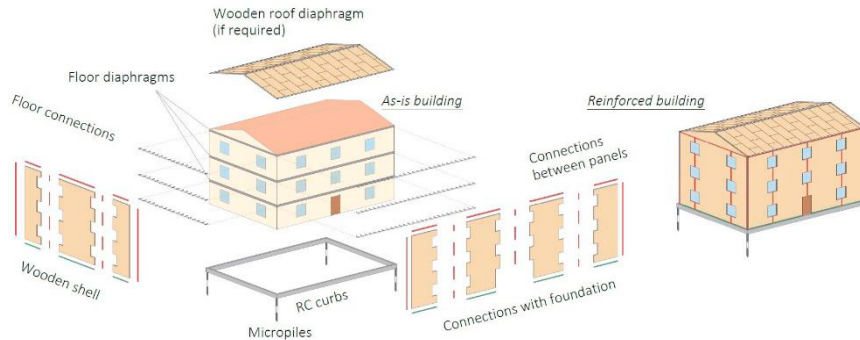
Wooden exoskeletons for the holistic renovation of existing buildings: possible layout of the structural layer.
